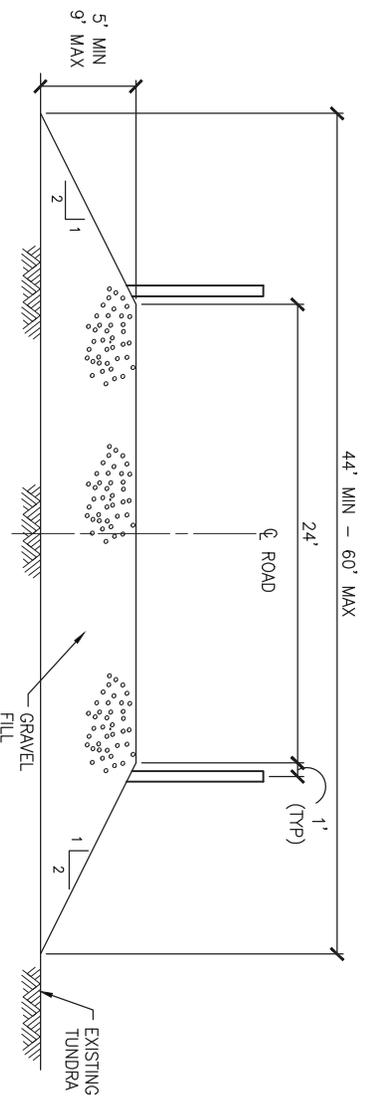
GRAVEL ROAD AND DRAINAGE STRUCTURES
